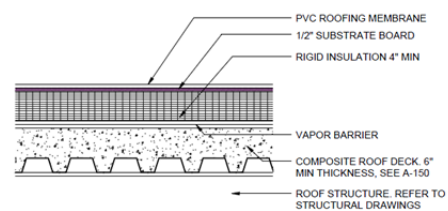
PVC Roof (From Construction Documents Provided by MBP)
